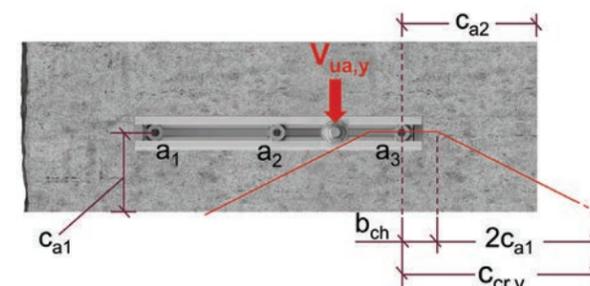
a – 90° FoS corner with anchor channels on both sides – Plan view.
